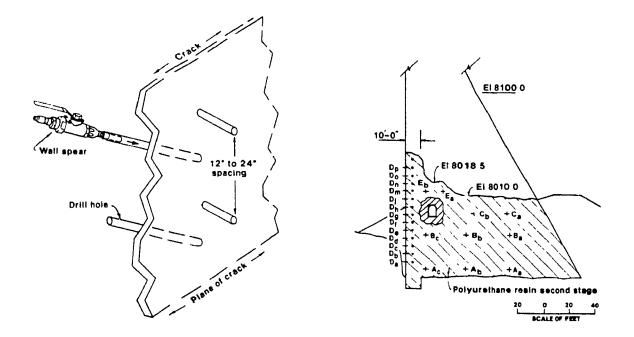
GALLERY WALL-CRACK INTERCEPT DRILL PLAN
